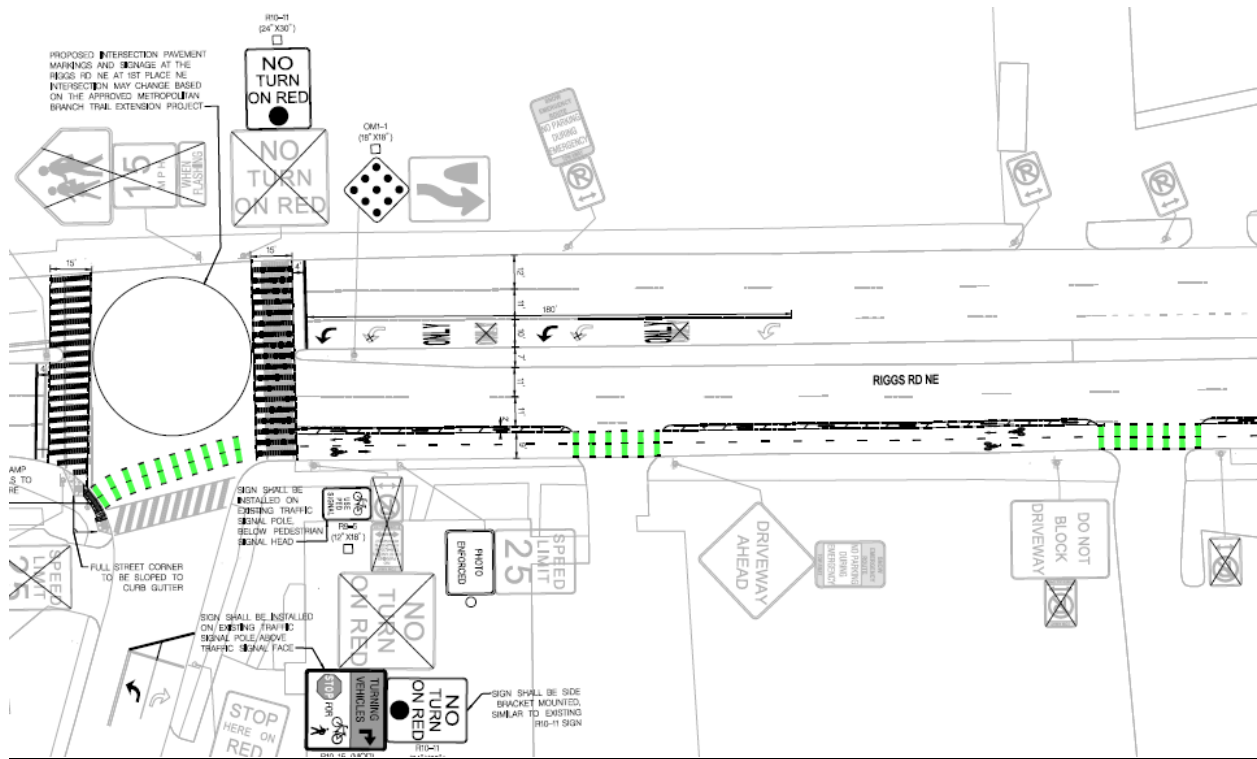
Bike lanes will connect to the Metropolitan Branch Trail at First Place NE.
